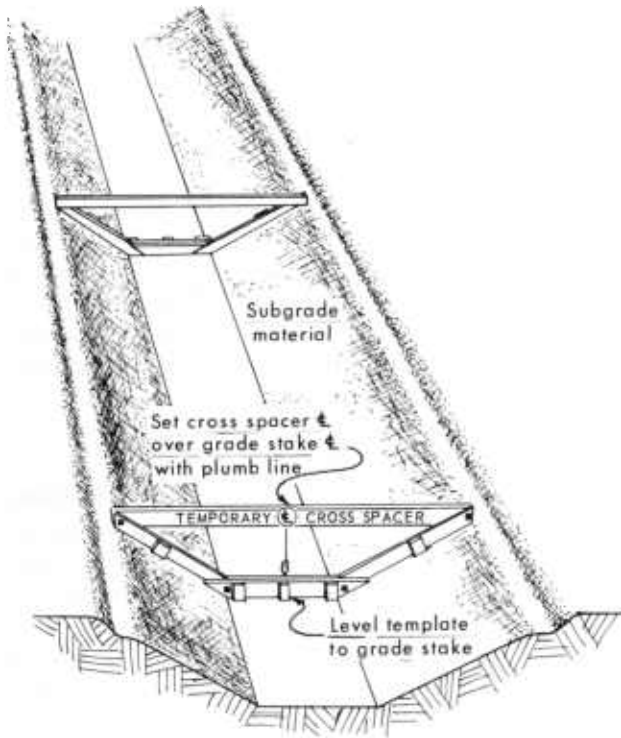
Detail of guide templates for panel-formed concrete linings.
